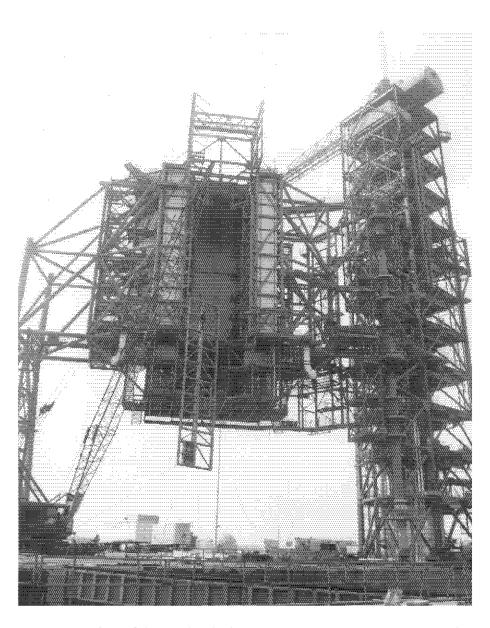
Construction of the Payload Changeout Room at LC39A, September 9, 1977. Source: John F. Kennedy Space Center Archives, 108-KSC-77PC-311.
